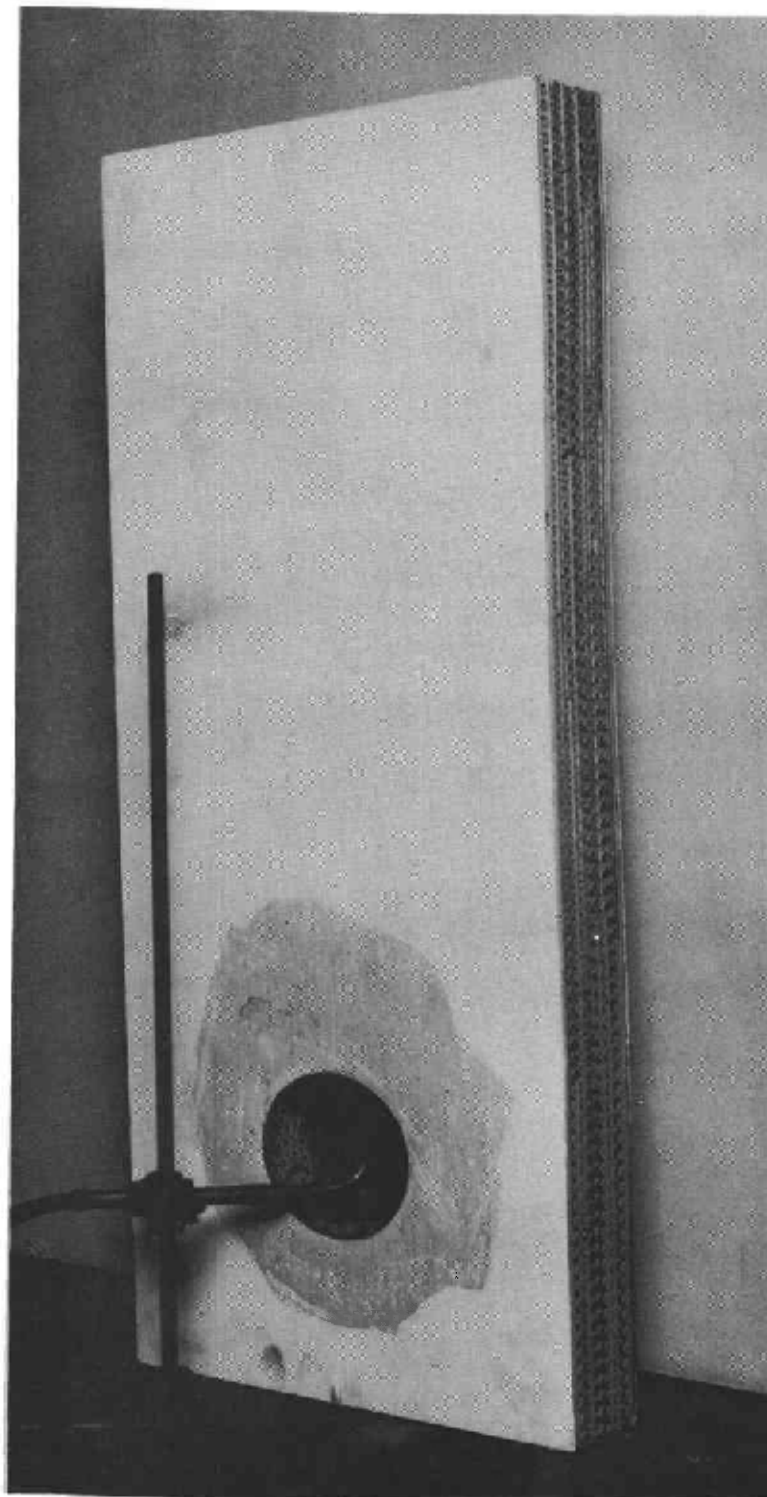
Arrangement of gas burner used to test flame spread in the honeycomb core of a sandwich panel.
